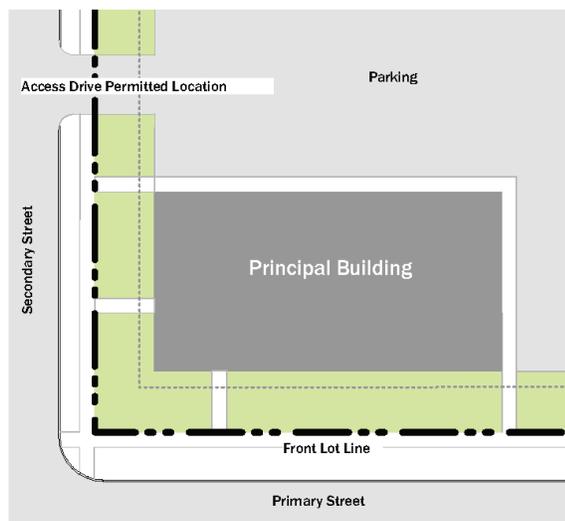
G (2). Secondary Street Frontage: Access Drive Permitted Location
